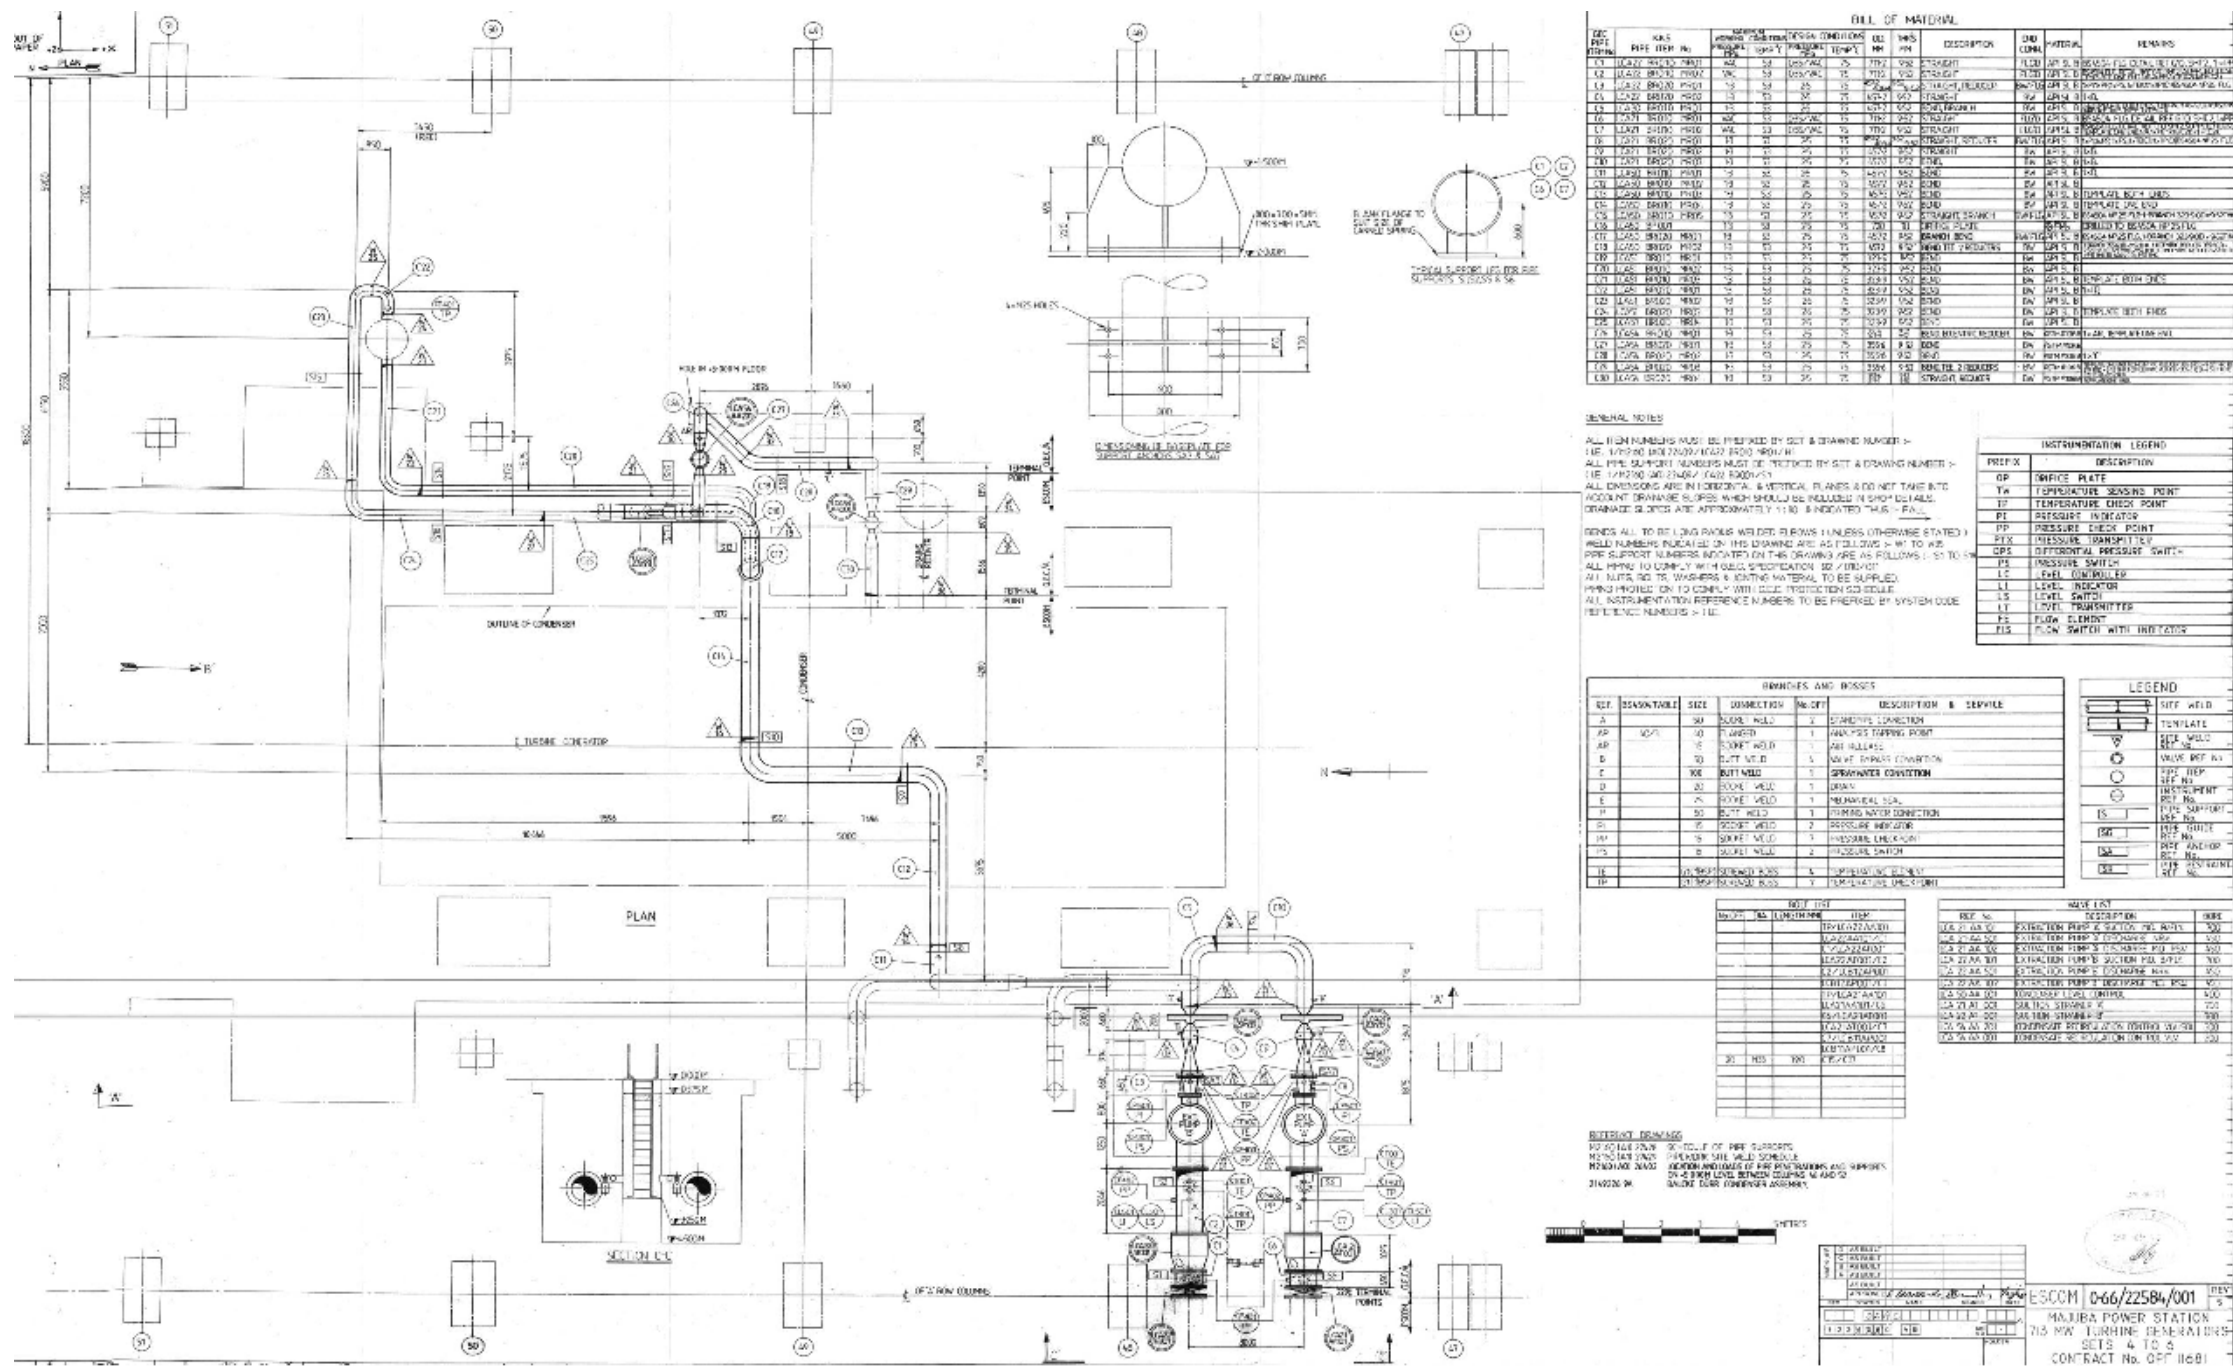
Condensate System Detailed Plant Arrangement Drawing A
